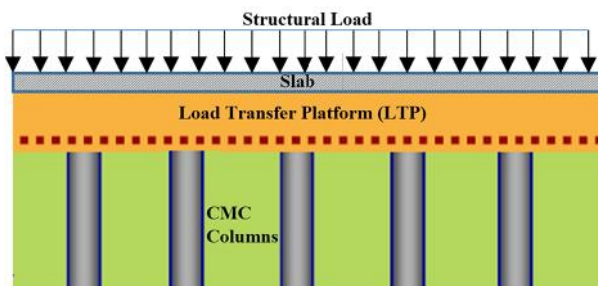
Typical Cross Section of CMC System (Abuhuroyroh, Et al 2014)
